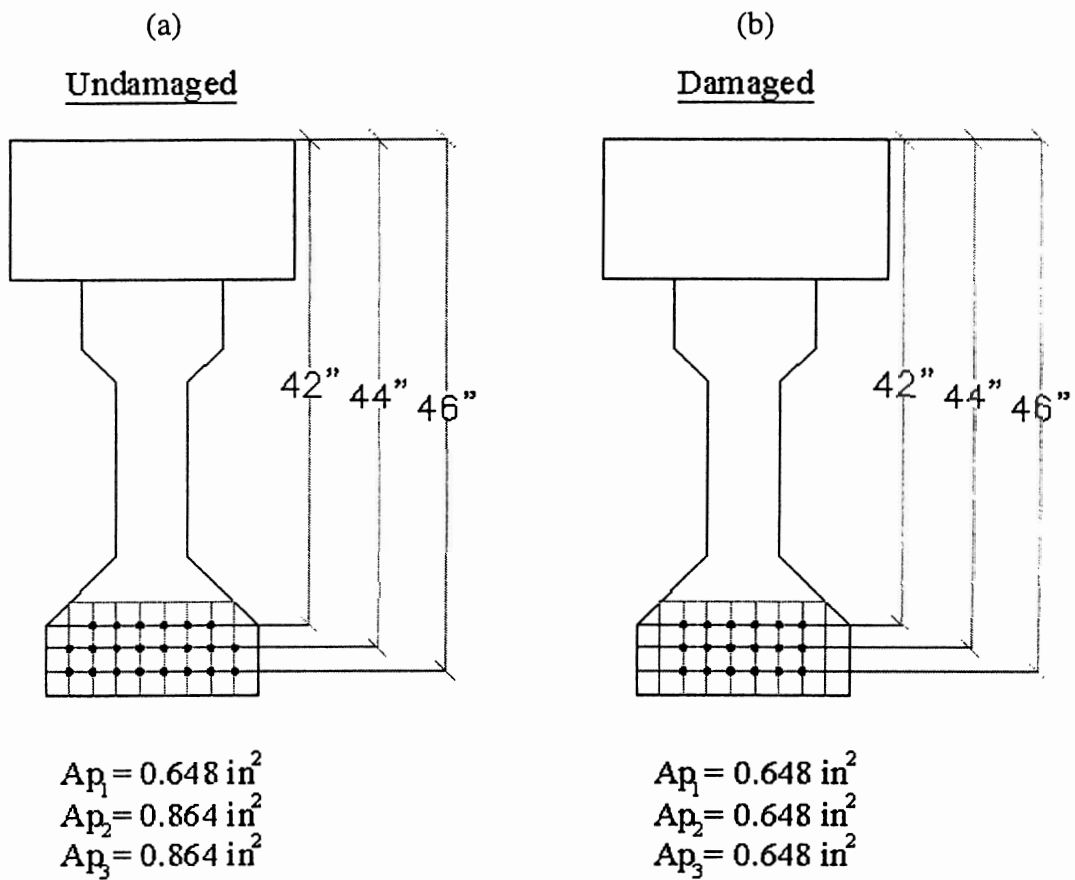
Steel Areas and Location for a) an Undamaged Section; and b) a Damaged Section
